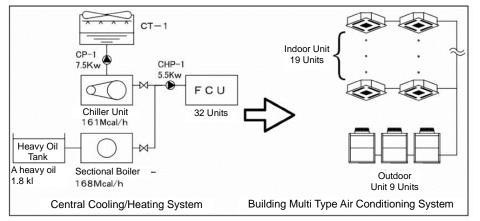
Renewal Construction of Building Multi Type Air Conditioning System
